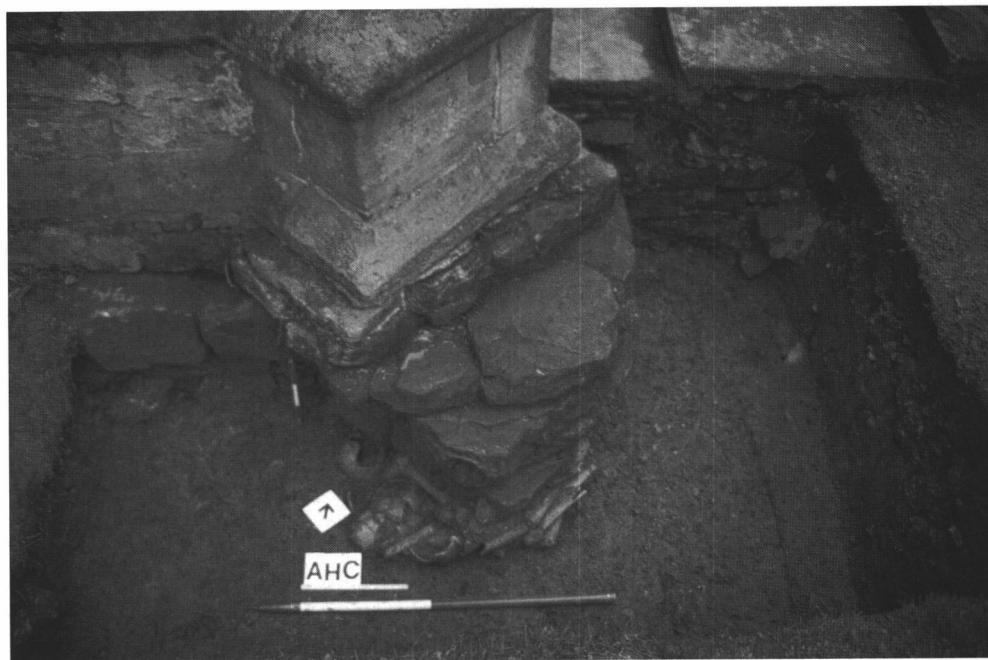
Ault Hucknall church: exposed foundation of south-west buttress looking west, showing disarticulated bone beneath and outline of degraded coffin to right. Scale 1m. *Photograph by L. Elliott.
